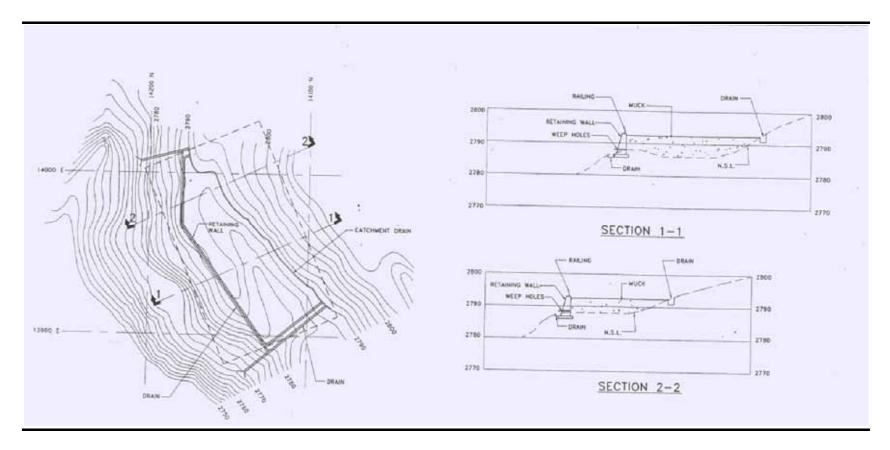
Plan and section of Plant Area (PA-1b) near Intermediate Storage Reservoir showing muck disposal arrangement Plant Area: 1 ha for 12000 m3 of Muck Reuse
